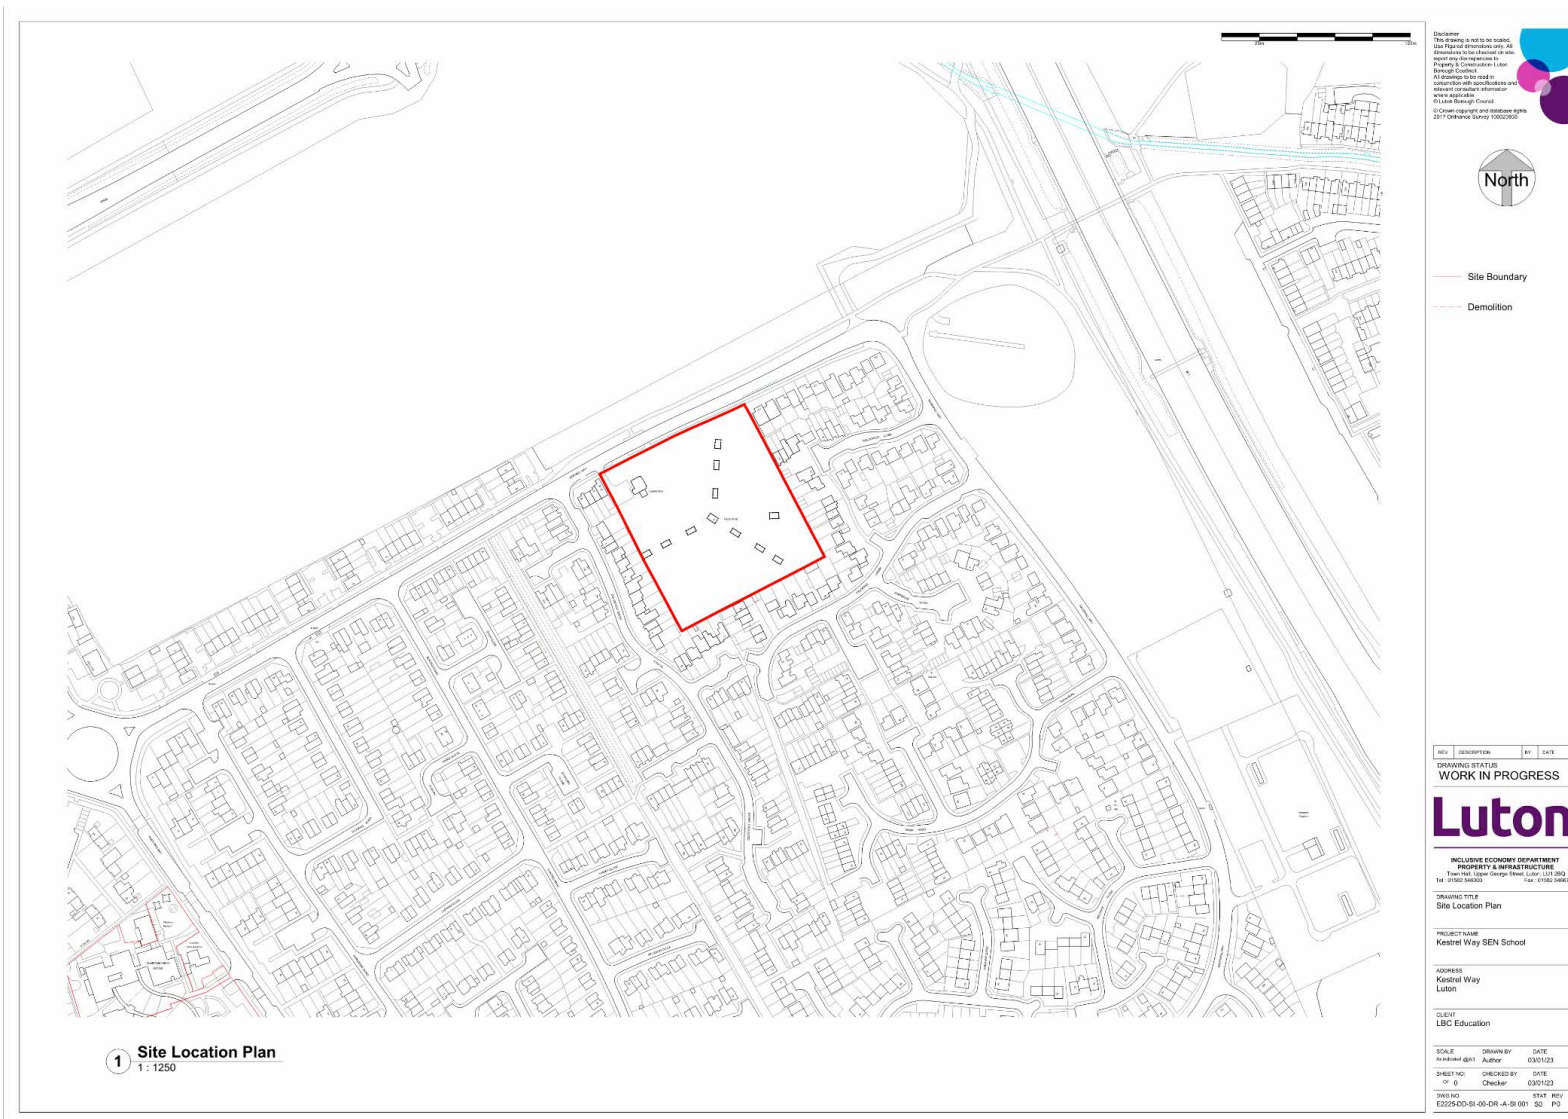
Site Location Plan (Drawing ref: E225-DD-SI-00-DR-A-SE-001, dated 03/01/2023)
